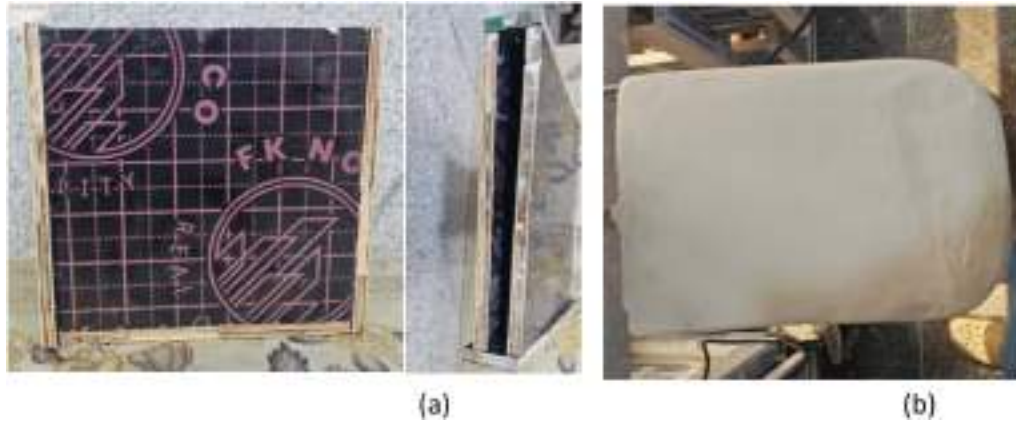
(a) Wooden mold. (b) Plaster mold.
